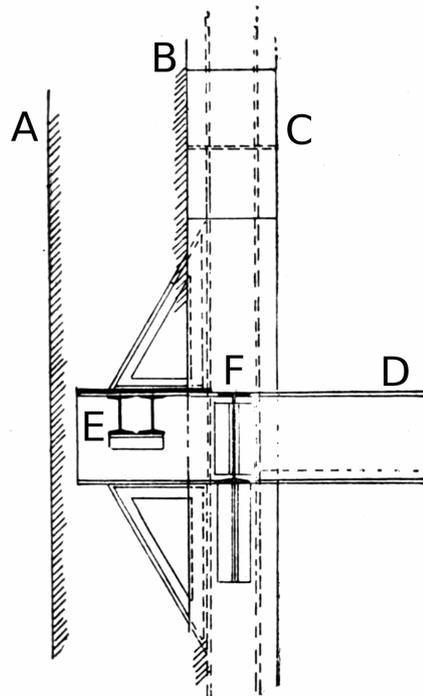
Exterior wall section of the St. Paul Building, showing the exterior (A) and interior (B) faces of the exterior wall, the spandrel column (C), an interior girder (D), the wall-carrying double spandrel beam (E), and the frame spandrel (F); (Birkmire 1906, p. 190)
